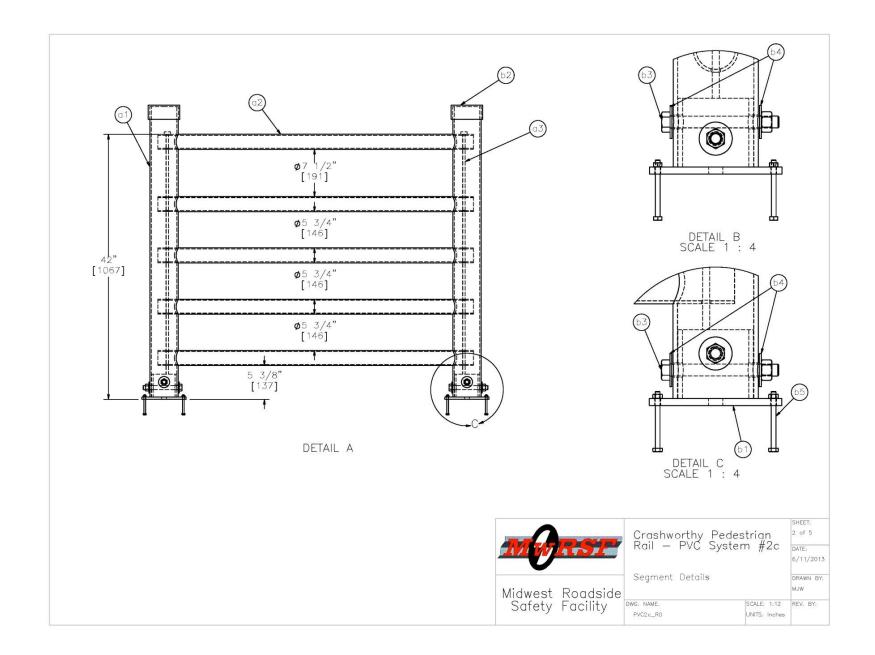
Modular PVC Rail, Design Concept PVC2-c (Sheet 2 of 5)
